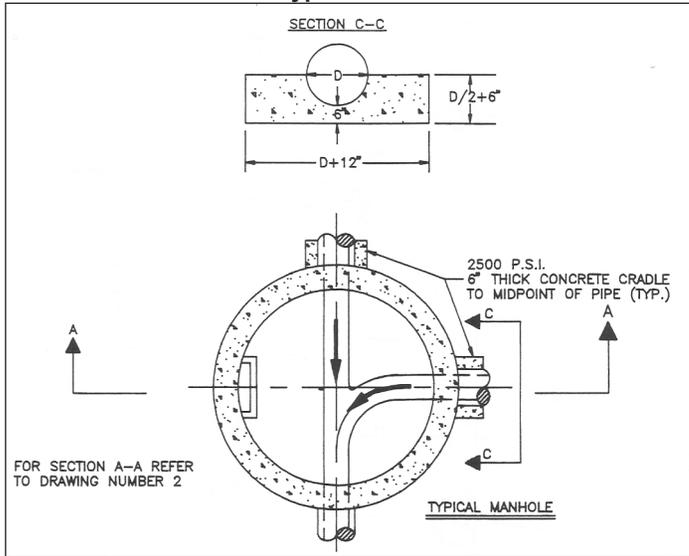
e Cast-in-place Base/Precast Wall Sections
